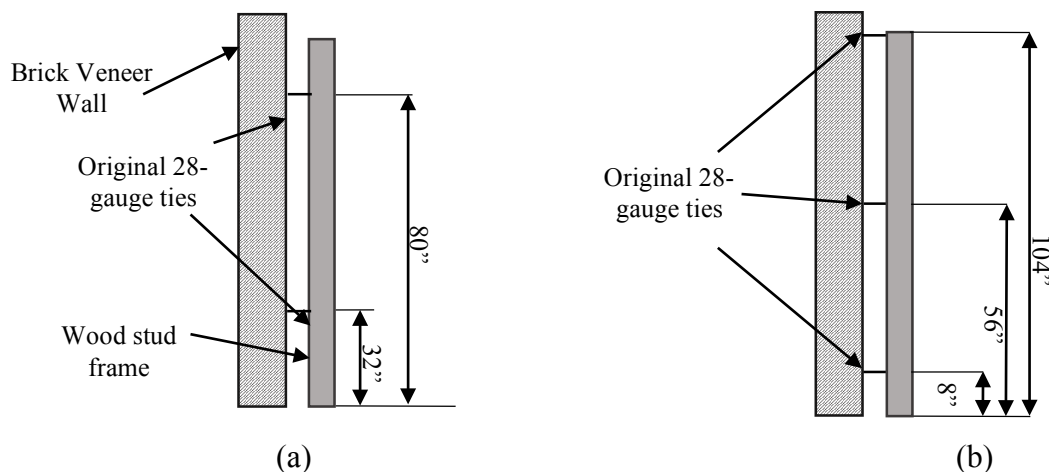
Schematics tie layout for larger than code compliant spacing: (a) Wall #3, and (b) Wall #4.
